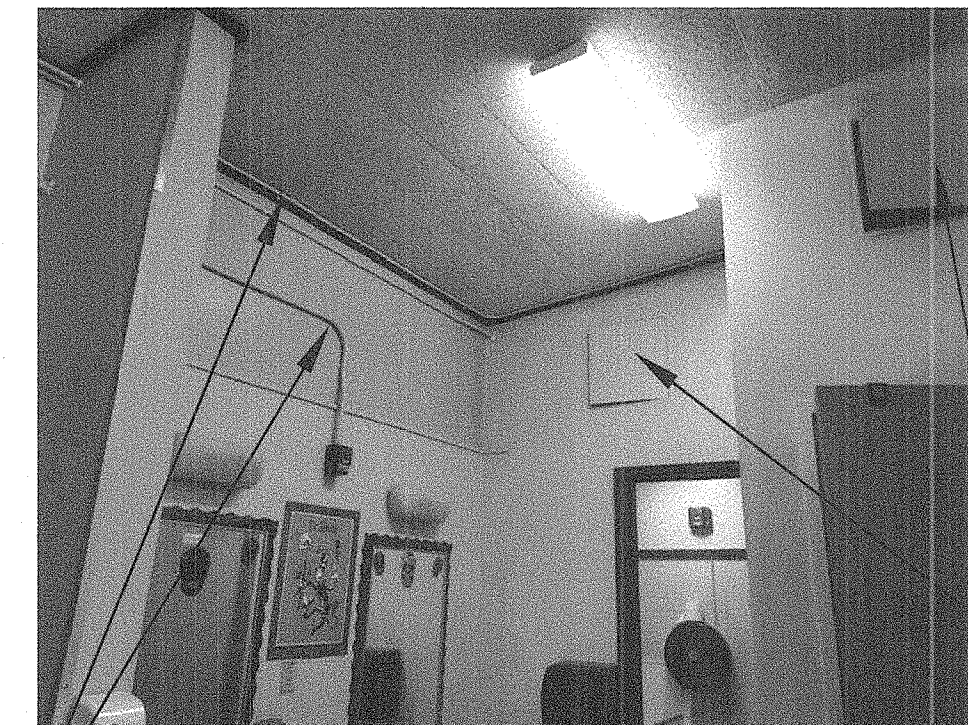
PHOTO B - EXISTING CONDITION SIM. AT CLASS RM 2
